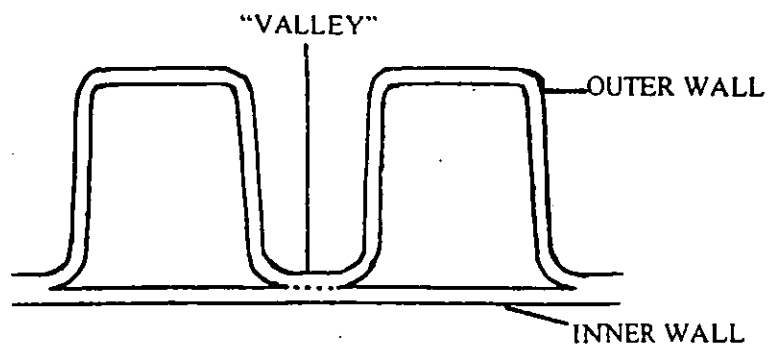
Typical Corrugated Pipe Wall Profile.
